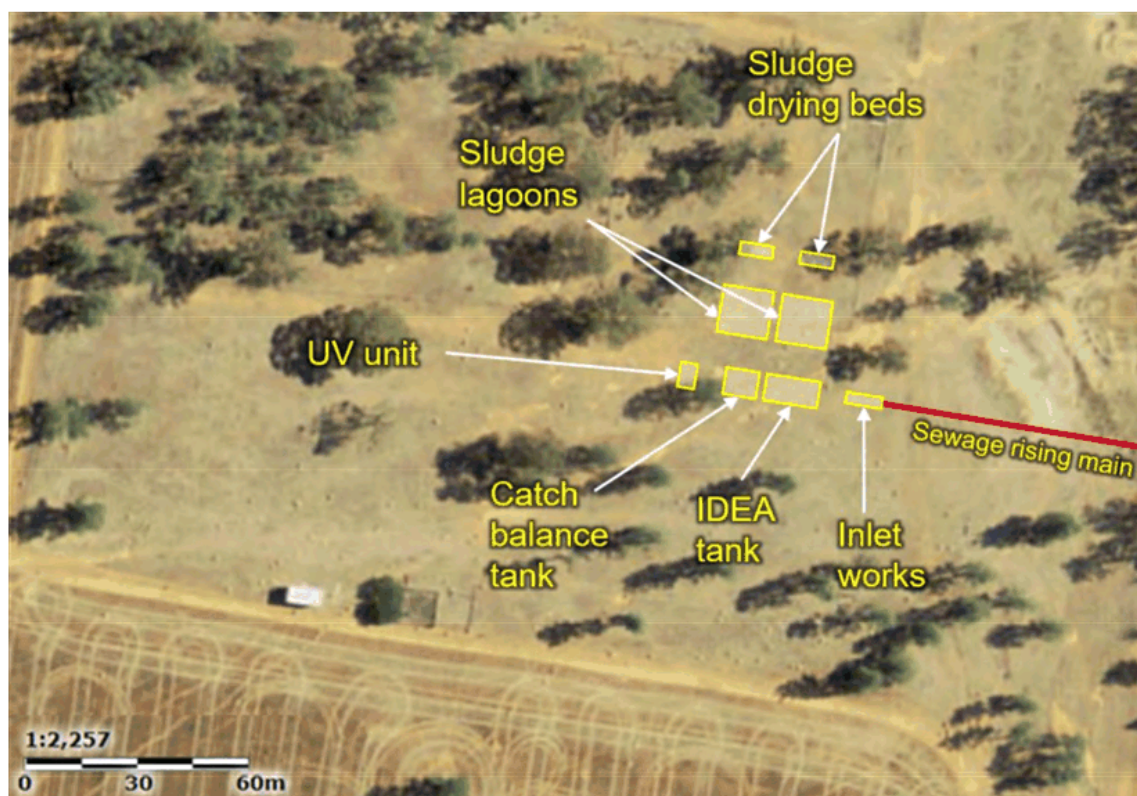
Ariah Park treatment sub-option C – proposed STP layout
